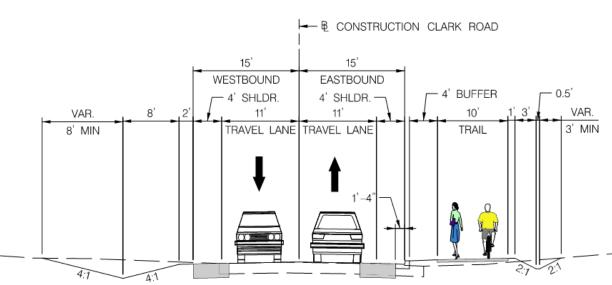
ALTERNATIVE 3 TYPICAL SECTION
